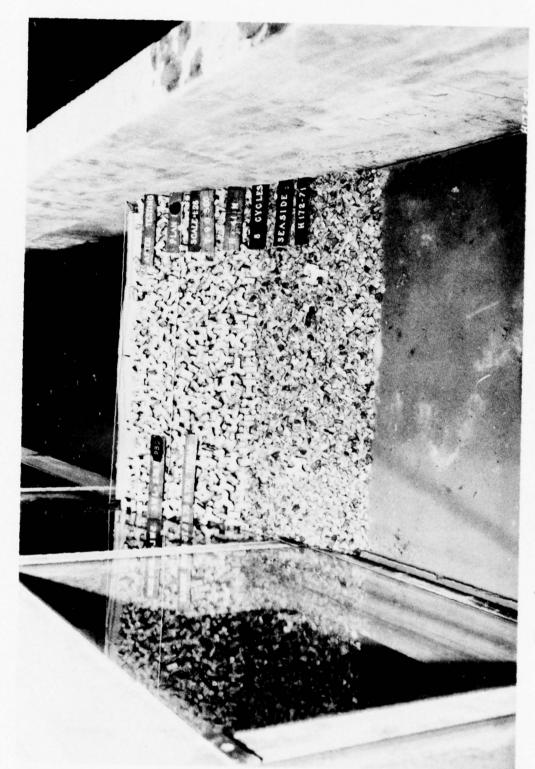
Seaside view of Plan 1 in the deeper water location after attack of 9-sec, 4.1-m waves at a swl of +2.35-m PBD
